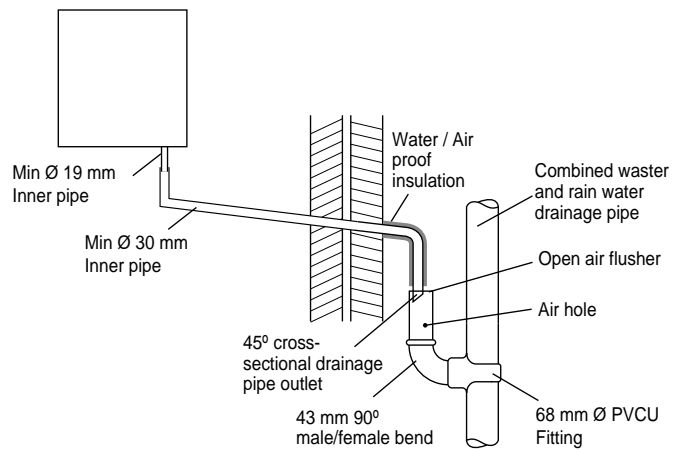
Connection of Condensate Drainage to Rain Water Drainage
